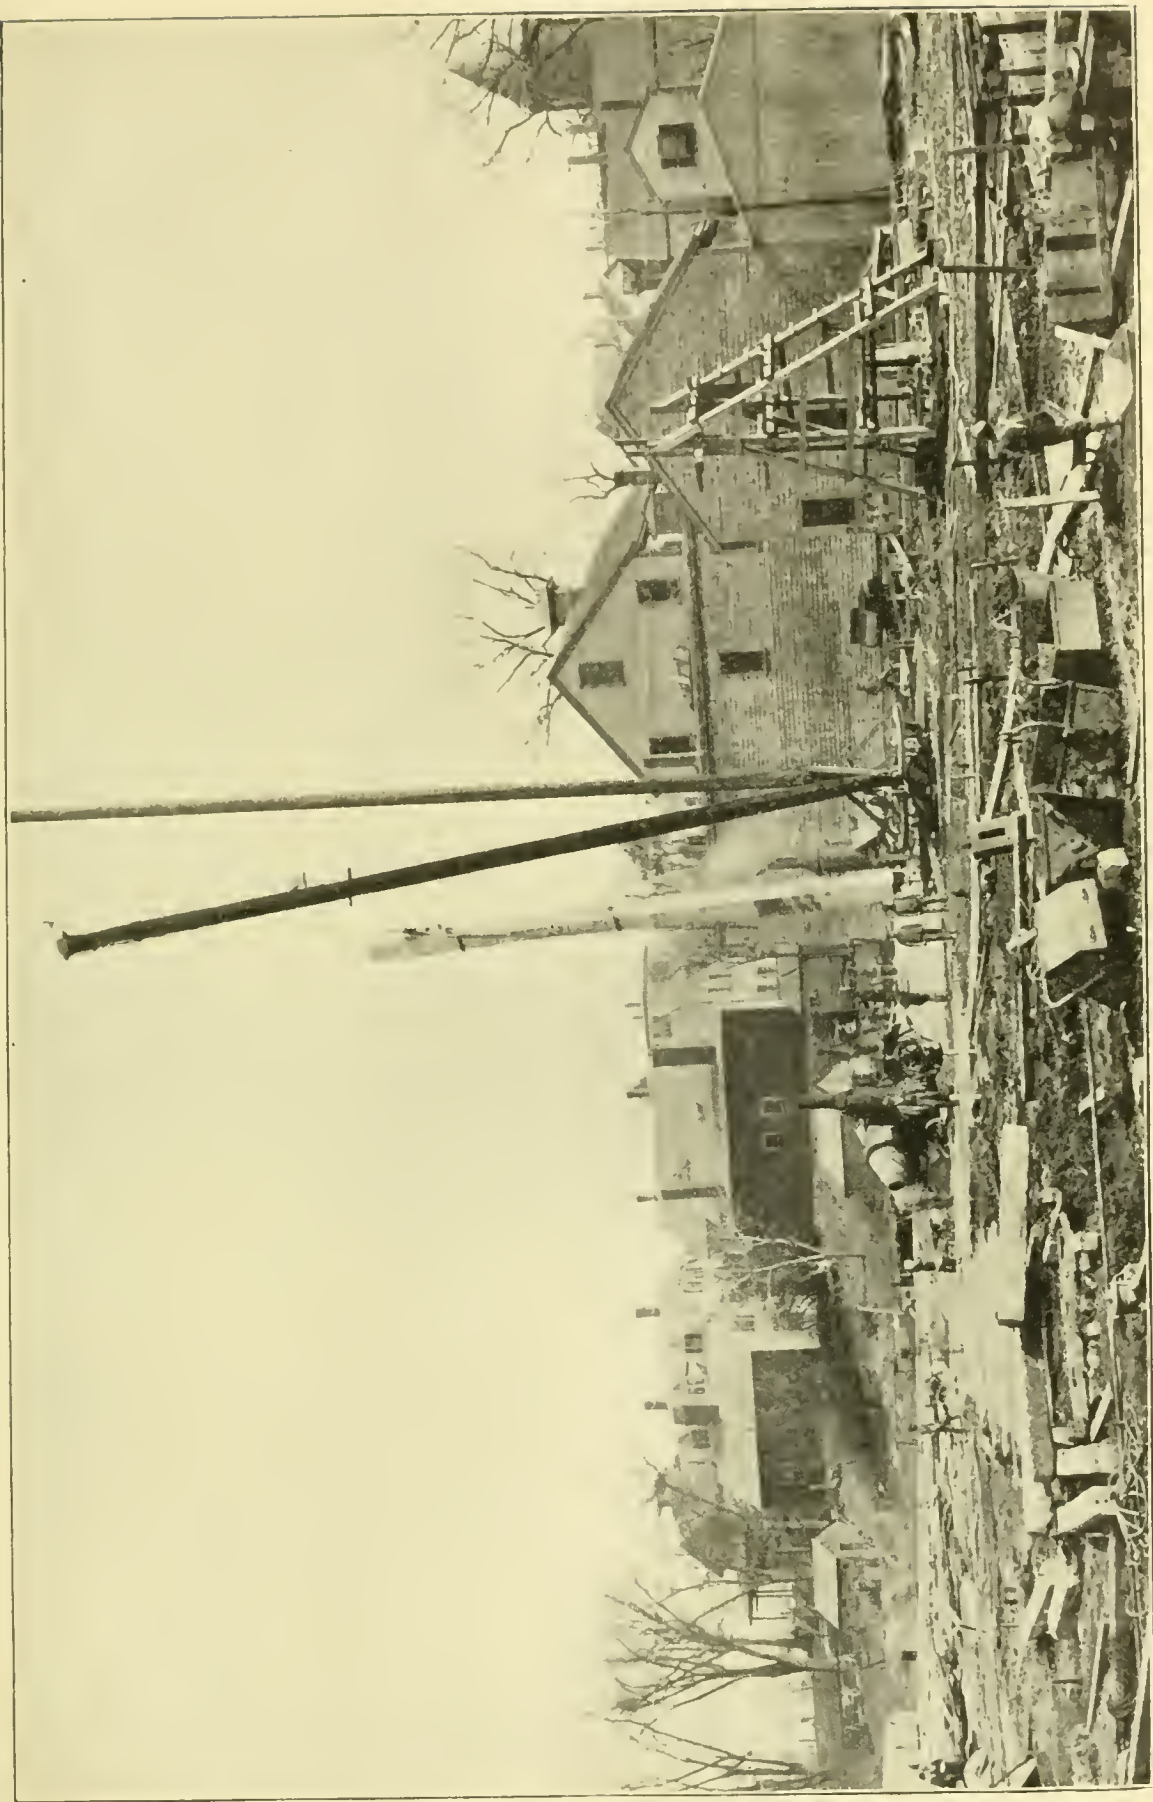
CAST PILES 36 FEET LONG, BEING HANDLED BY DERRICK PREPARATORY TO DRIVING.
